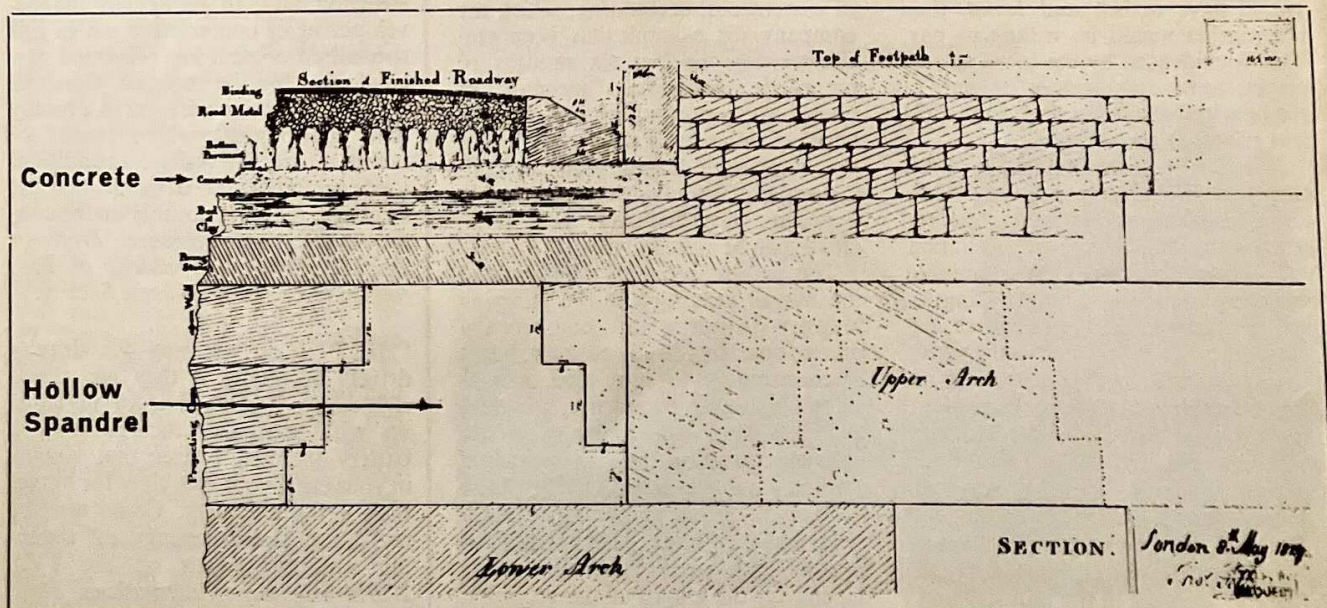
Proposed cross-section from an original Telford drawing of 1829 for Dean Bridge, Edinburgh.
